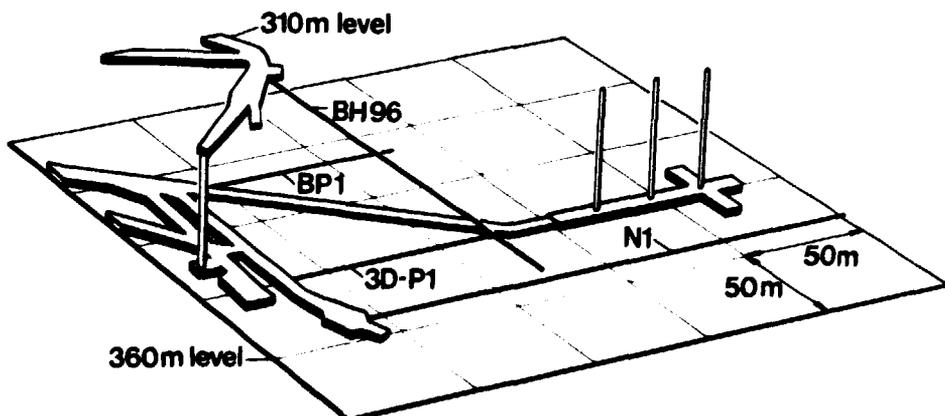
Location of the 3-D test site within the Stripa Mine.
